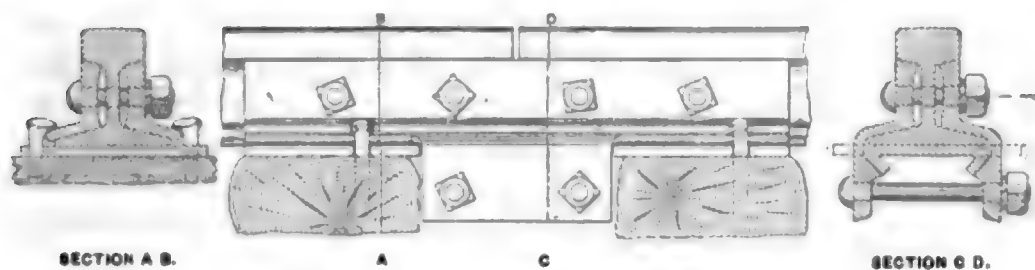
BRIDGE JOINT, GIRDER FORM.
